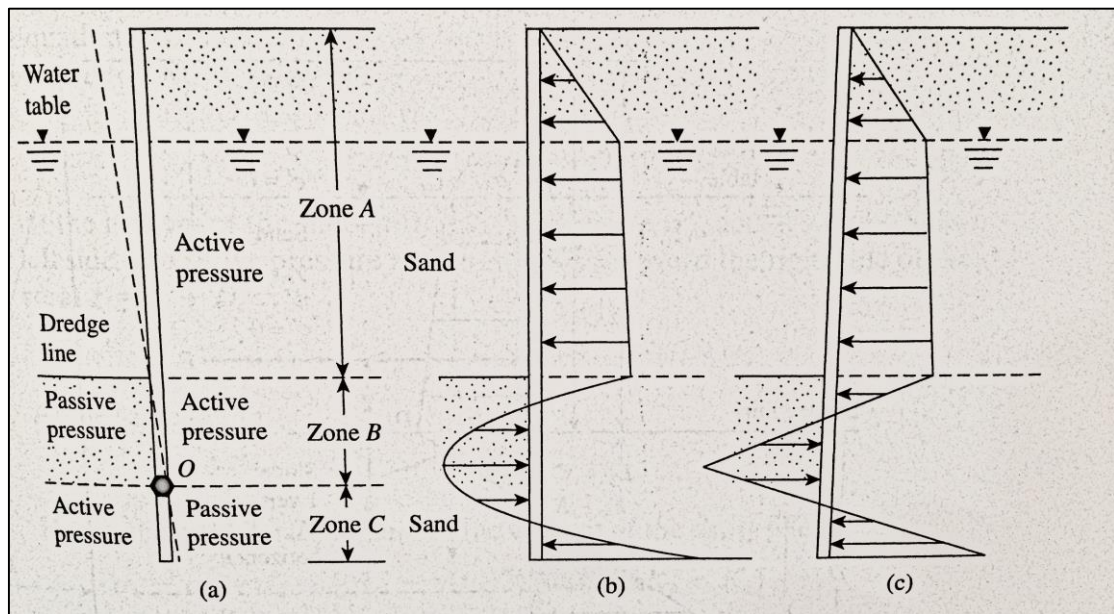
Cantilever sheet pile penetrating sand (Das 1990)
